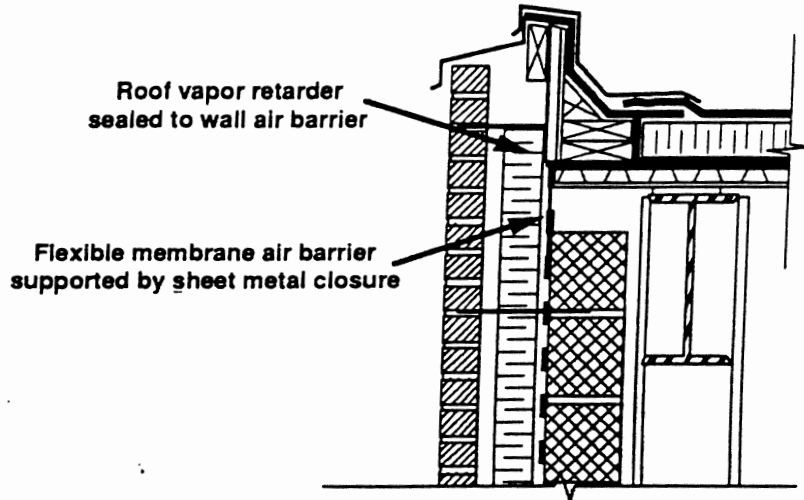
Masonry Wall/Roof Edge - Steel Frame (Turenne)
